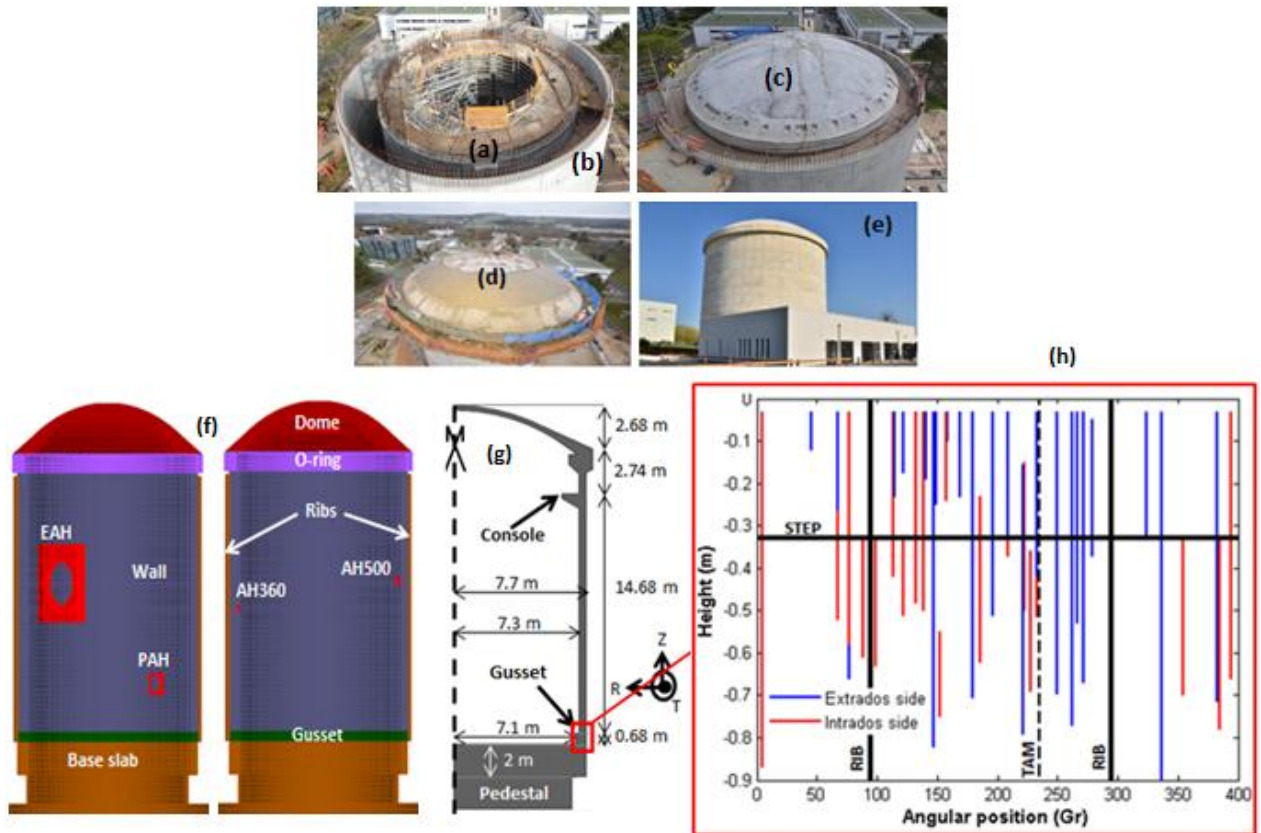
Experimental 1:3 scaled double walled containment building - VerCoRs mock-up (a) inner wall (b) outer wall (c) inner dome (d) outer dome (e) full mock-up (f) schematic drawing of the inner wall structural parts (g) 2D-axis view of the VerCoRs inner wall (h) in situ observations of the cracks' distribution at the gusset level from the intrados and extrados sides (12 days after casting).
